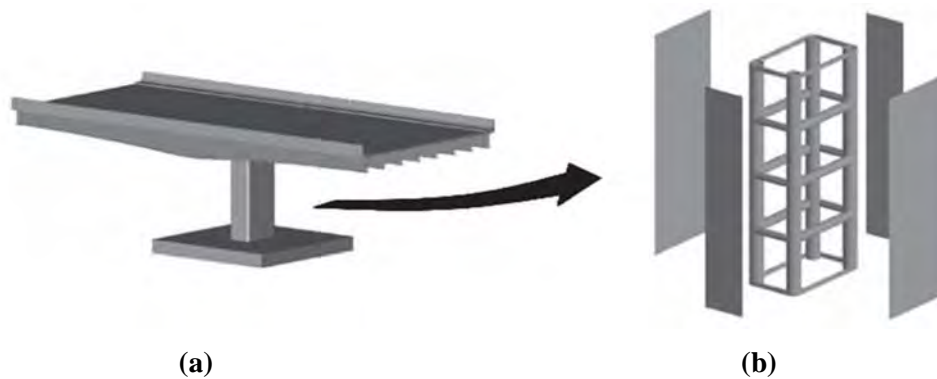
Final Box Pier with SPSWs Configuration (Keller and Bruneau, 2008)
